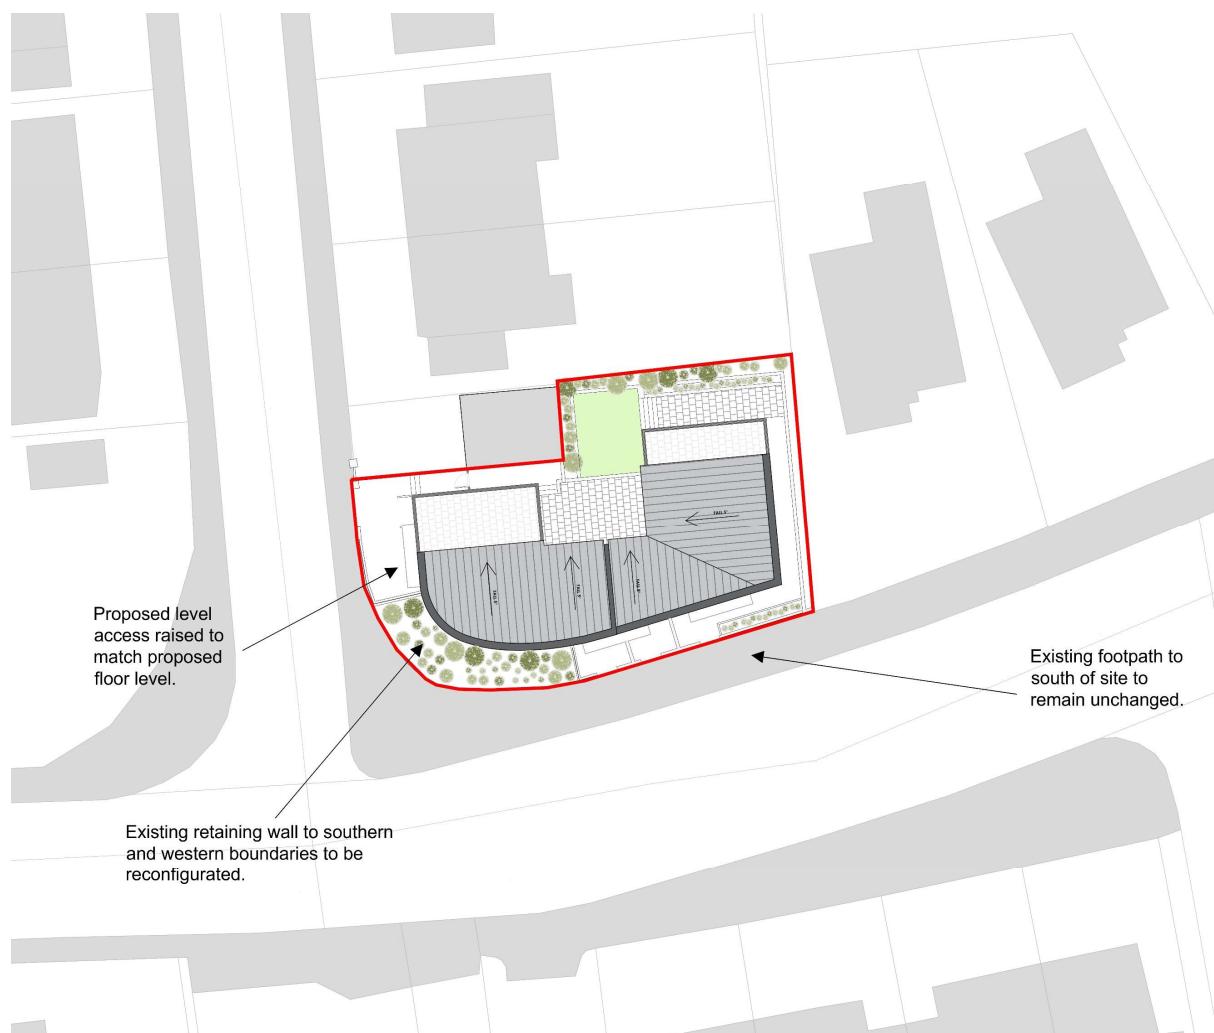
Proposed site plan indicating proposed public realm treatments.
